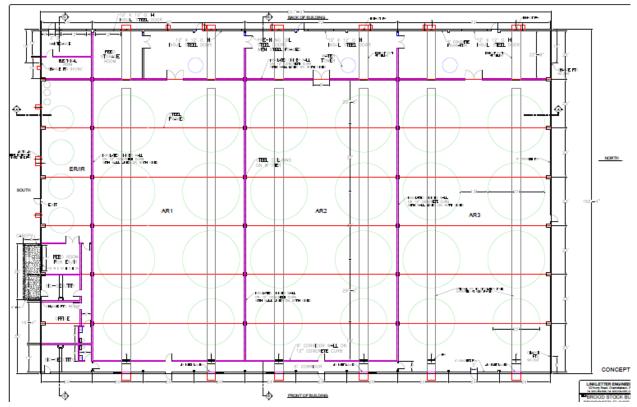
Broodstock Structure (Building 2) - Floor Plan
